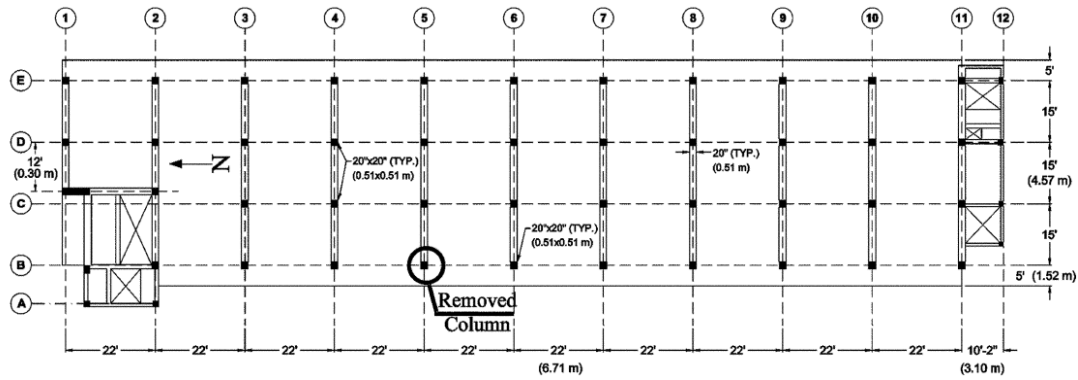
Plan view of the structure (Sasani et al. 2007)
